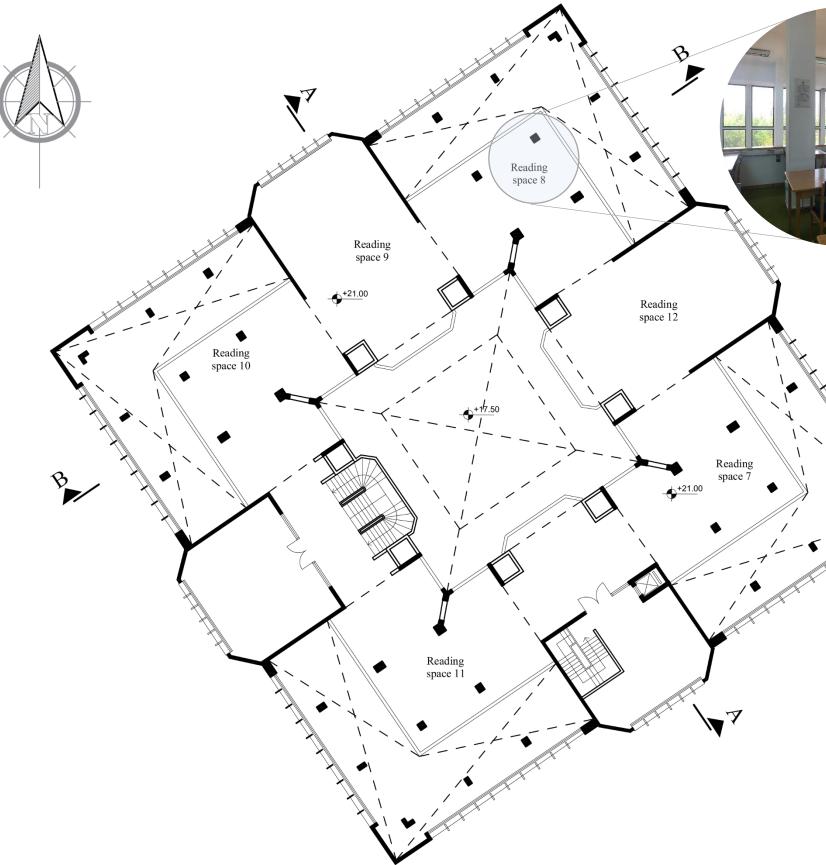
Third Floor Plan, Scale 1:250. Drawn by the author.
